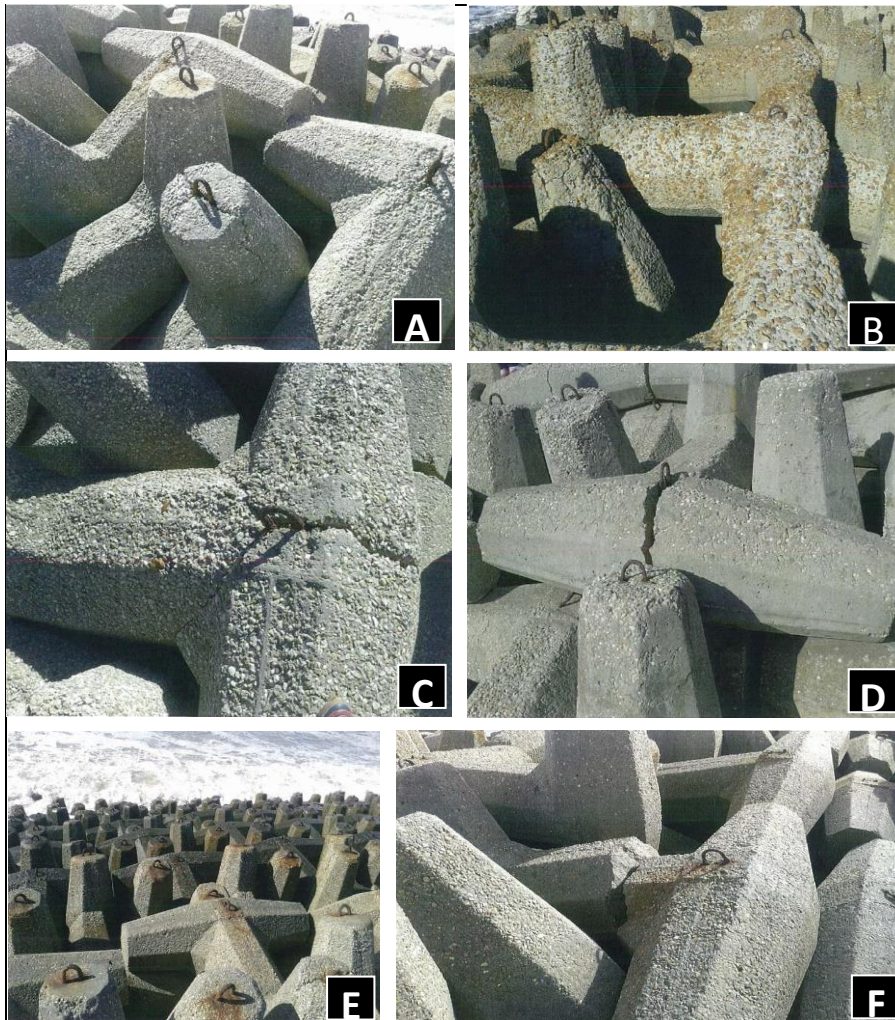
Revetment Dolos: A) Concrete containing fractures Limestone; and B) Concrete containing siliceous gravel; C) Visible cracks due to rusting of steel skewers; D) Complete breakage and separation due to rusting of steel bars; E) Units exposed to waves have a sound outer surface; and F) Fractures in some units flukes away from steel skewers.
